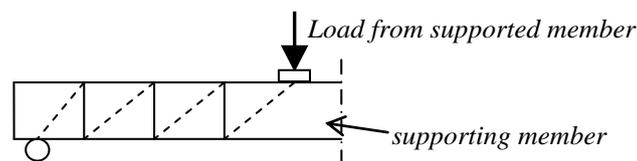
Load path in case of a direct support. The load from the supported member acts from above on the supported member and can be resisted by truss action.
